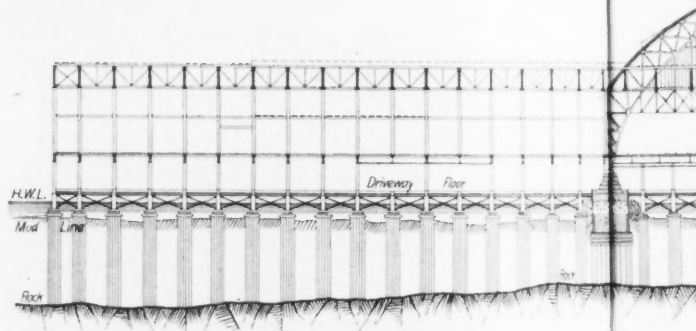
SECTIONAL ELEVATION, PARALLEL TO RIVER, SHOWING
